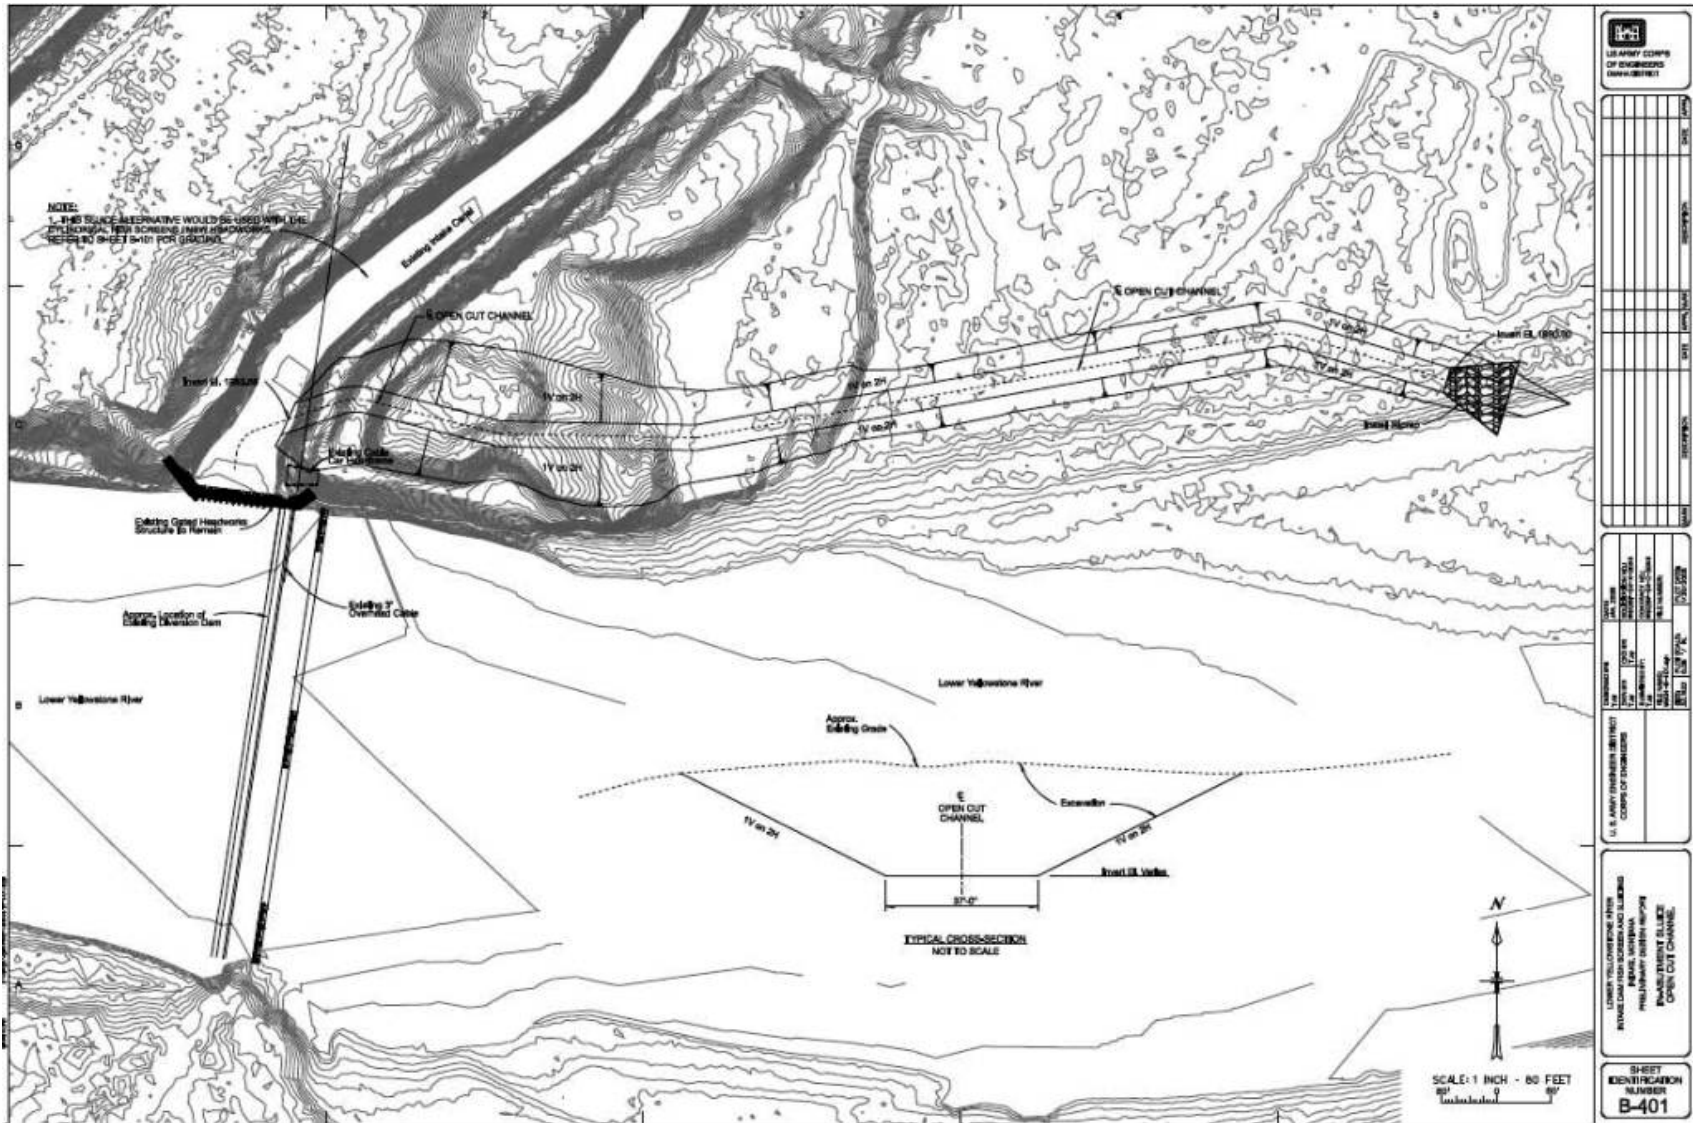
Abutment Open Channel Sluiceway Layout.
